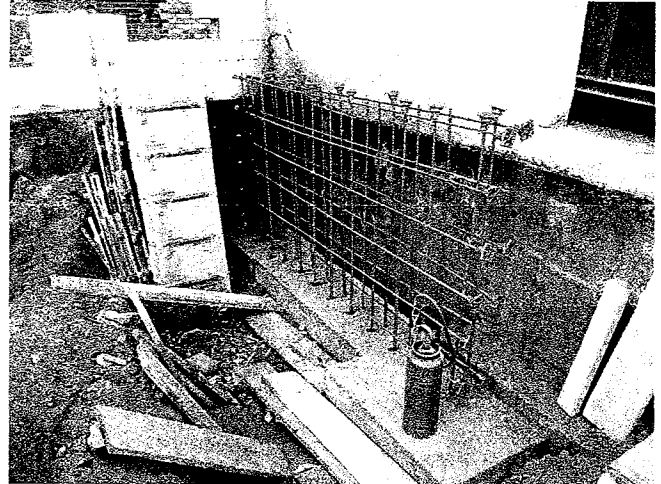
Reinf. @ Grid G.1 / 4.2 wall (looking south)
